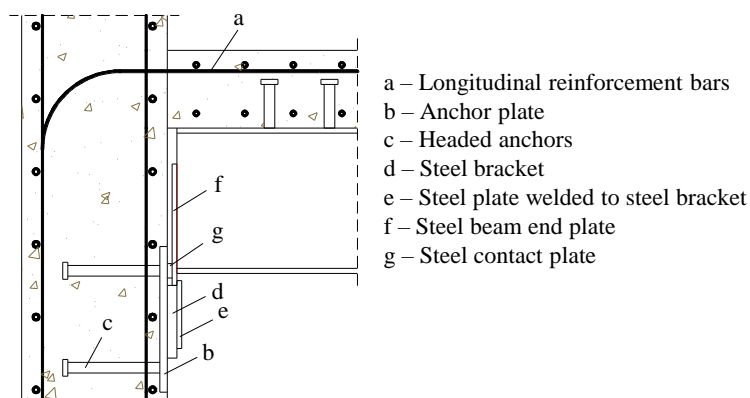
Composite beam to reinforced concrete wall joint configuration according to the *InFaSo* project report [15]
